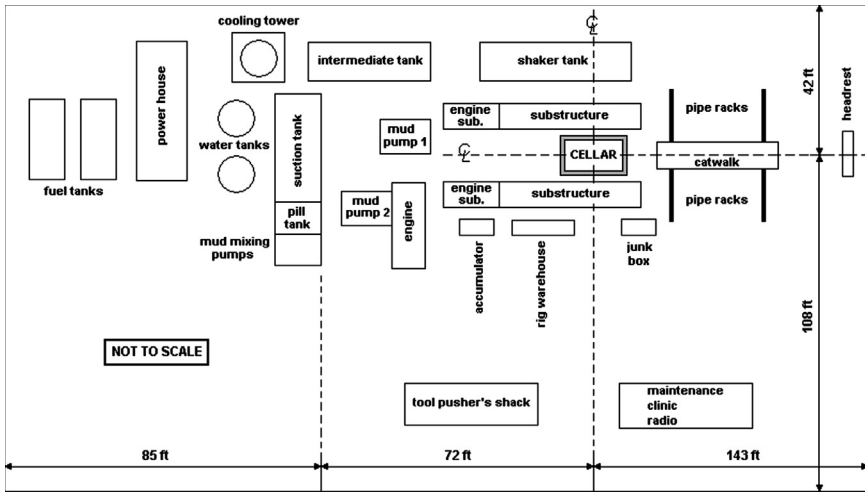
Drill pad to support a 3000 m rig. After Ref. [3].
